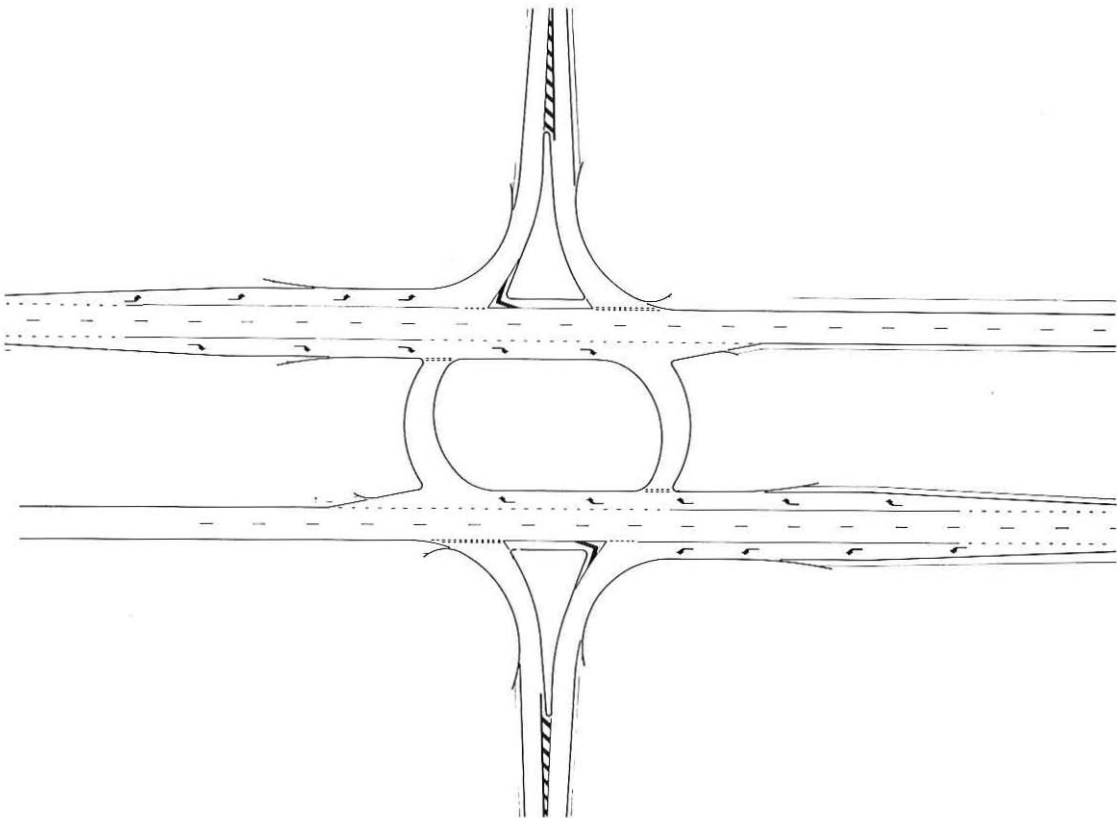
Layout of the intersection treatment for rural roads with wide medians
